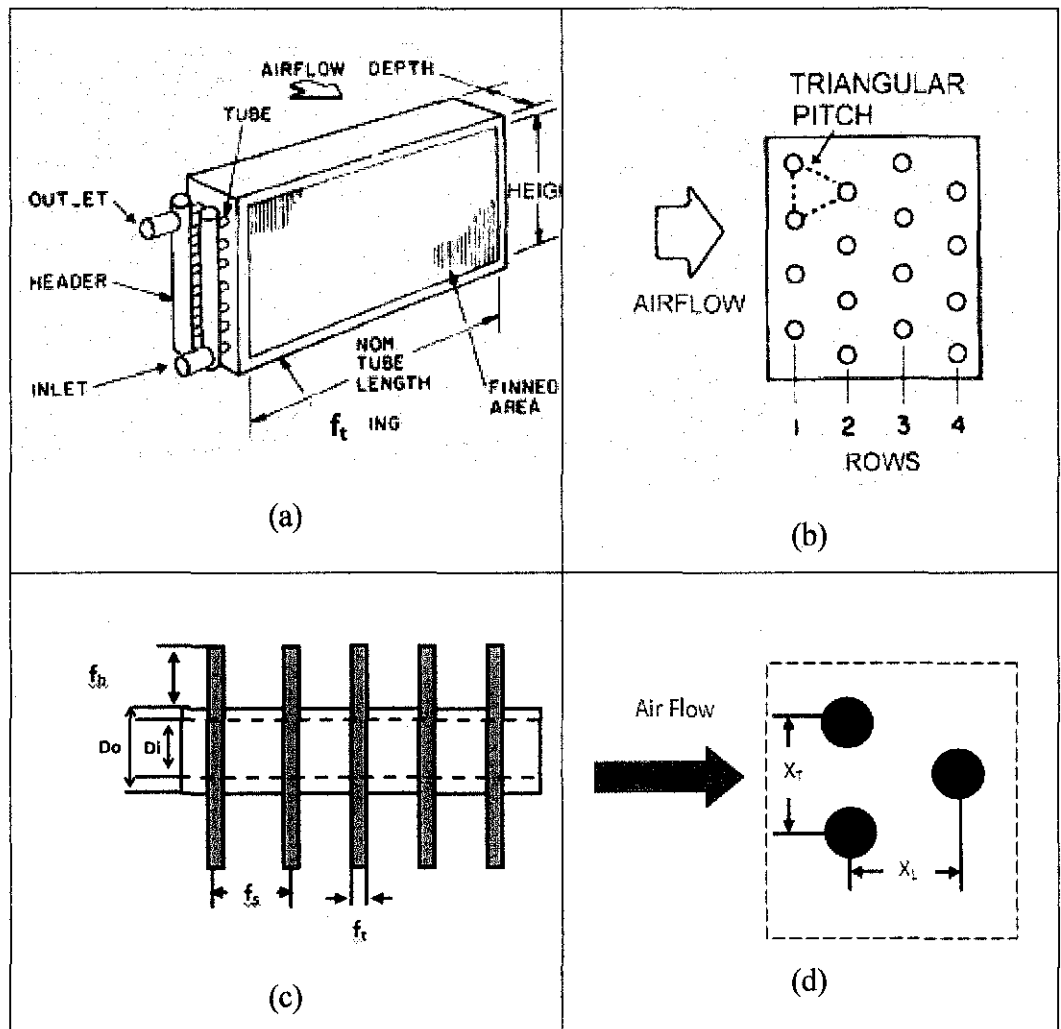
(a) Chilled water coil construction. (b) A 4-row coil with a 4-tube face. (c) Geometry of the radial fin perpendicular to tube. (d) Tube transverse and longitudinal pitch in tube bank
